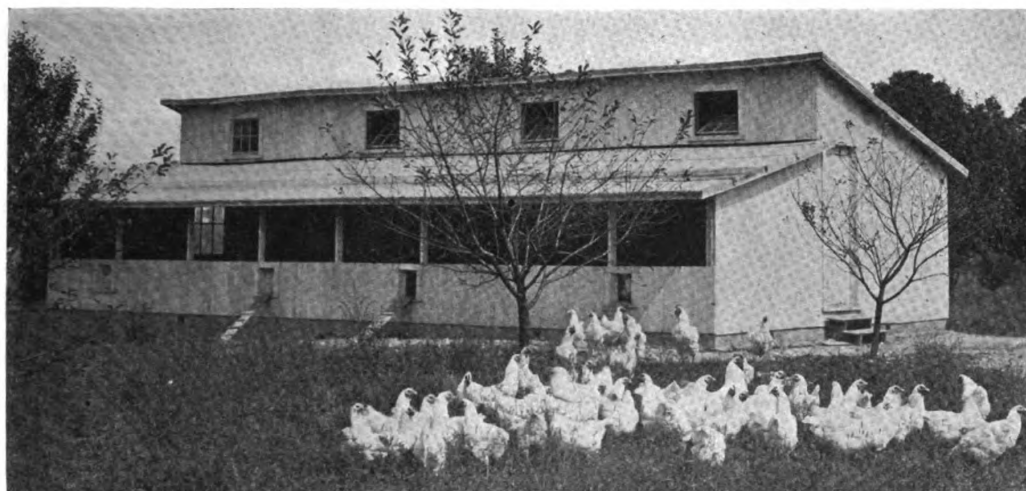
A One-Story Frame Single Brooder House of Semi-Monitor Type
